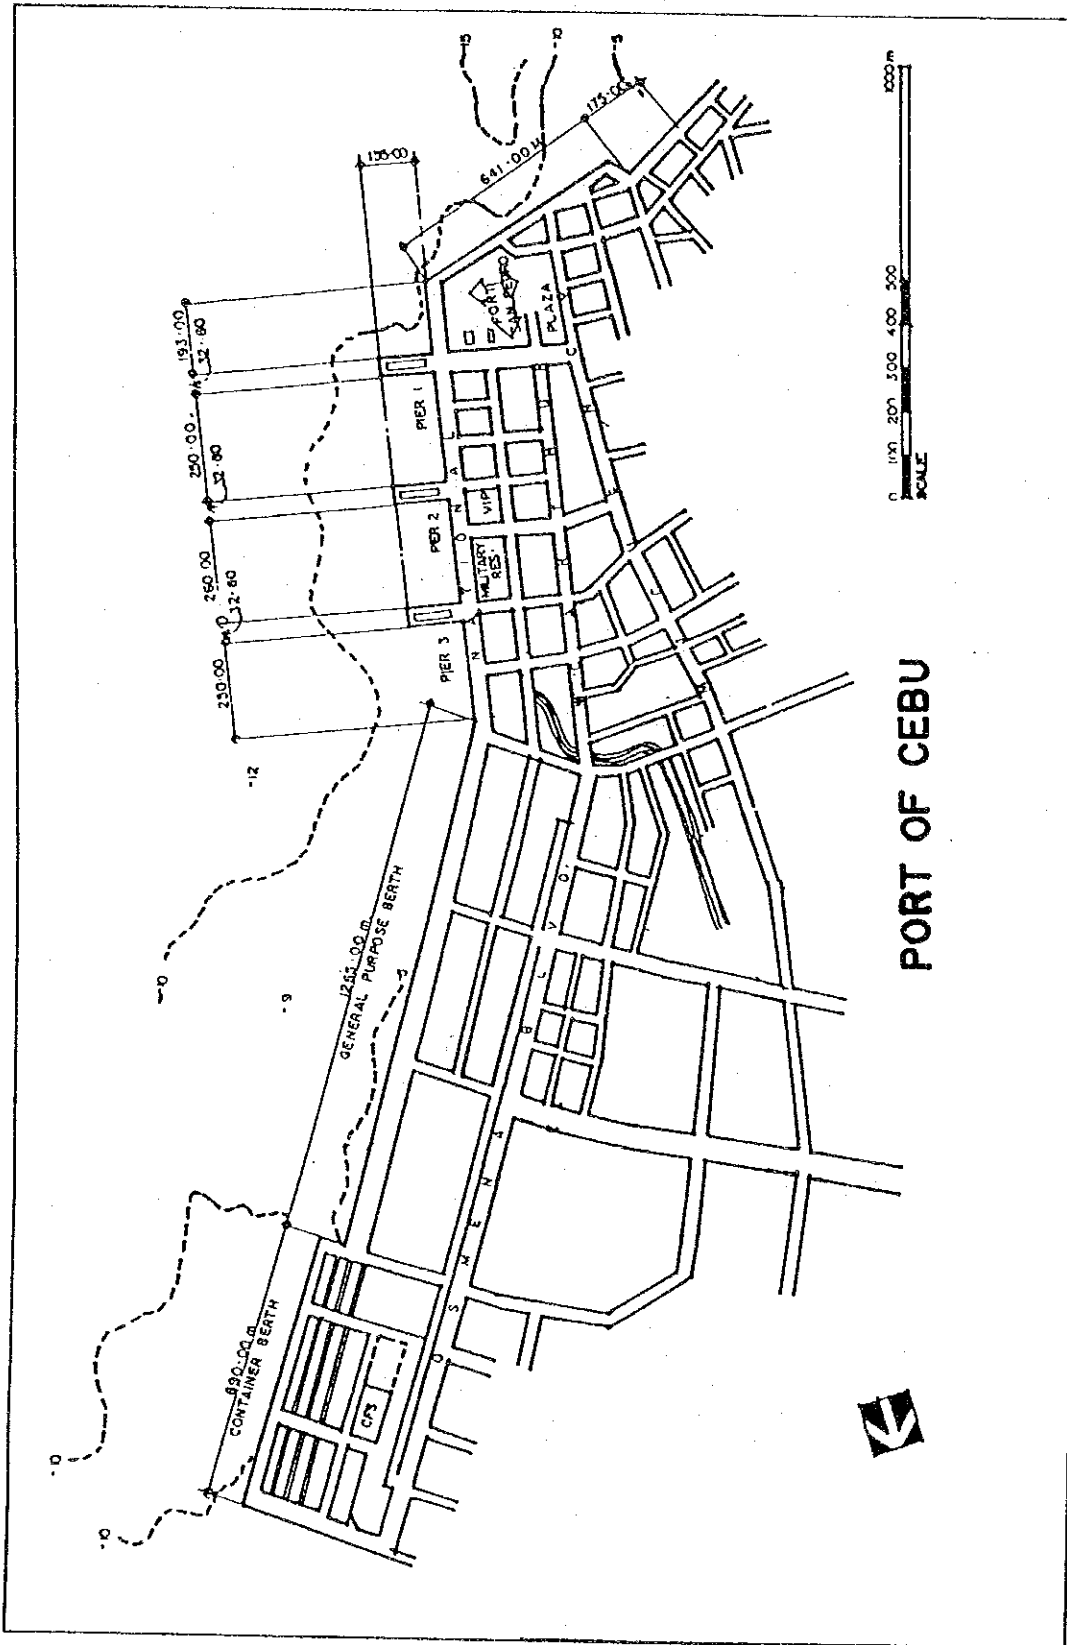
PLAN OF CEBU PORT (A)
